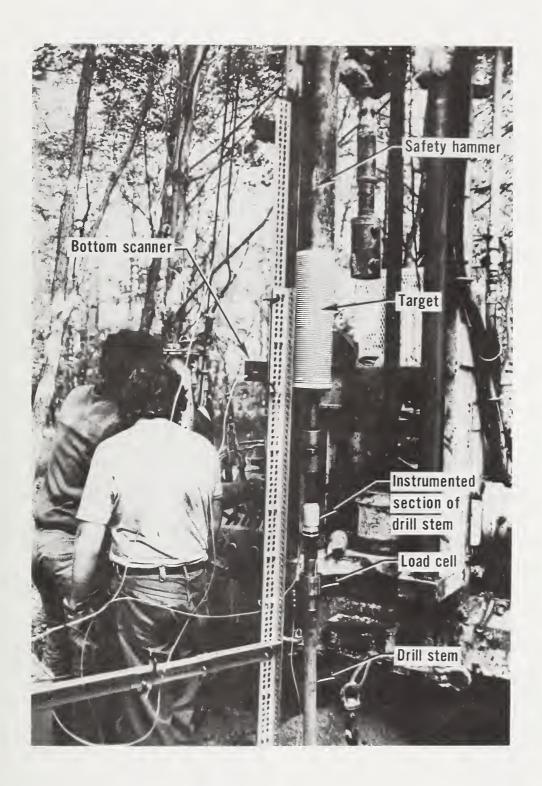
Photograph of test setup showing targeted safety hammer, instrumented section of drill stem, load cell, and top and bottom scanner opposite target. Angle frame is adjusted to be parallel to hammer prior to test.
